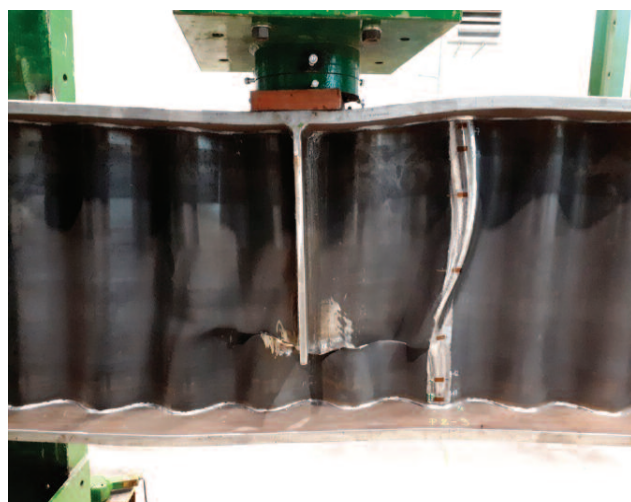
Mechanism of fatigue failure of the tested elements
